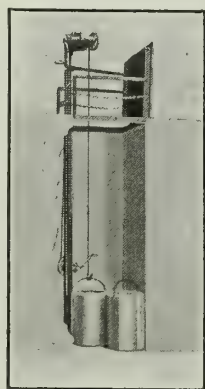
Shows Door Opened Completely, Safety-guarded. Cans hooked on by operator at sidewalk level
